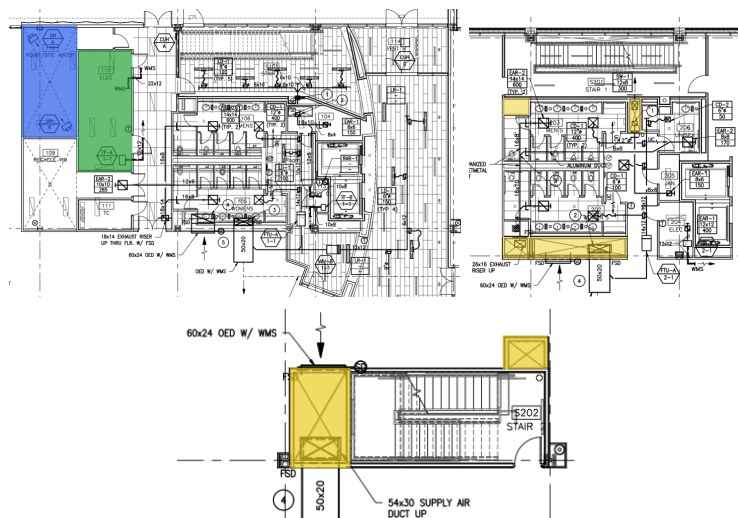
Highlighted Floor Plans Showing Mechanical Spaces
